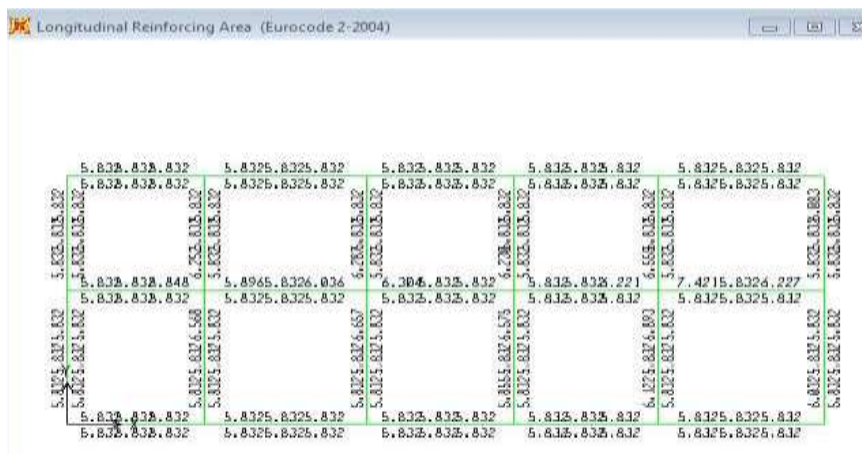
Beam Longitudinal Reinforcement Area, [2], 2023.
